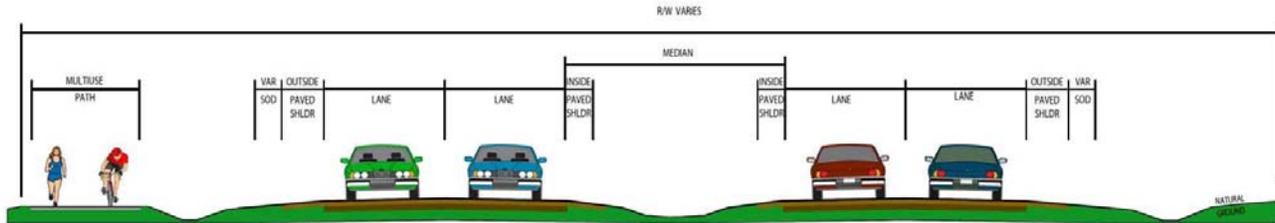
General typical cross section for Kirby Parkway through Shelby Farms Park
